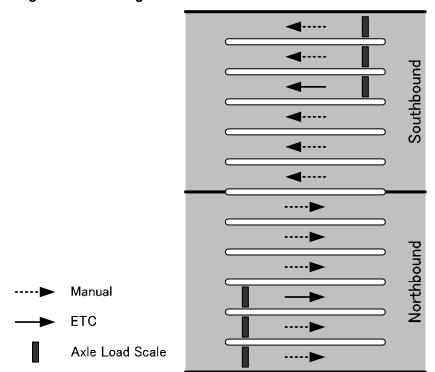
Arrangement Plan of Axle Load Scale on Toll Barrier
